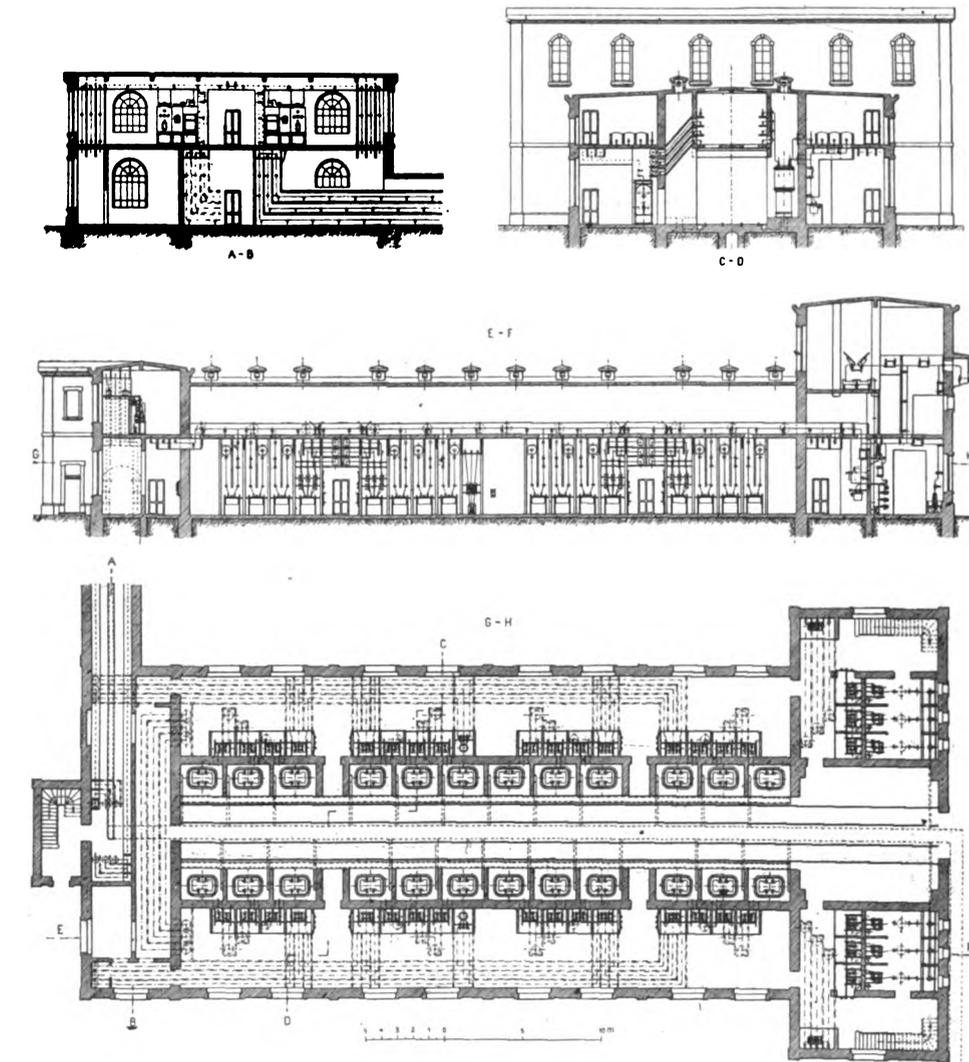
PLAN AND ELEVATION, STEP-UP TRANSFORMER STATION AT PIATTAMALA.
